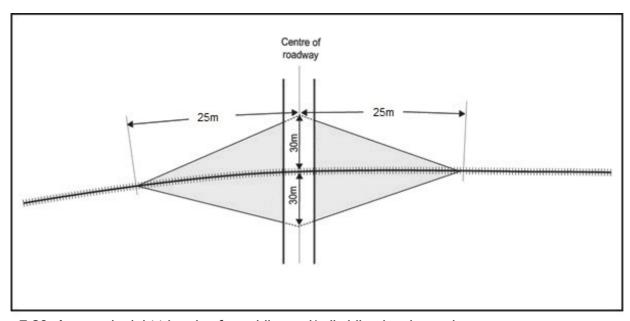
Approach sight triangles for public road/rail siding level crossings
